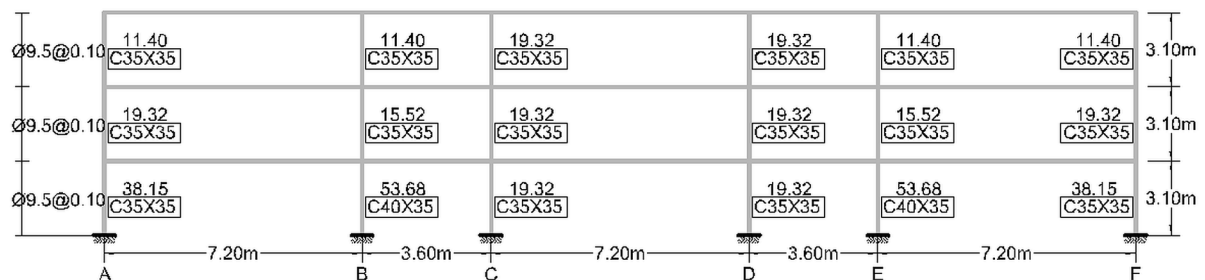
Educational facility, geometry and reinforcement in beams of the Frame 5
